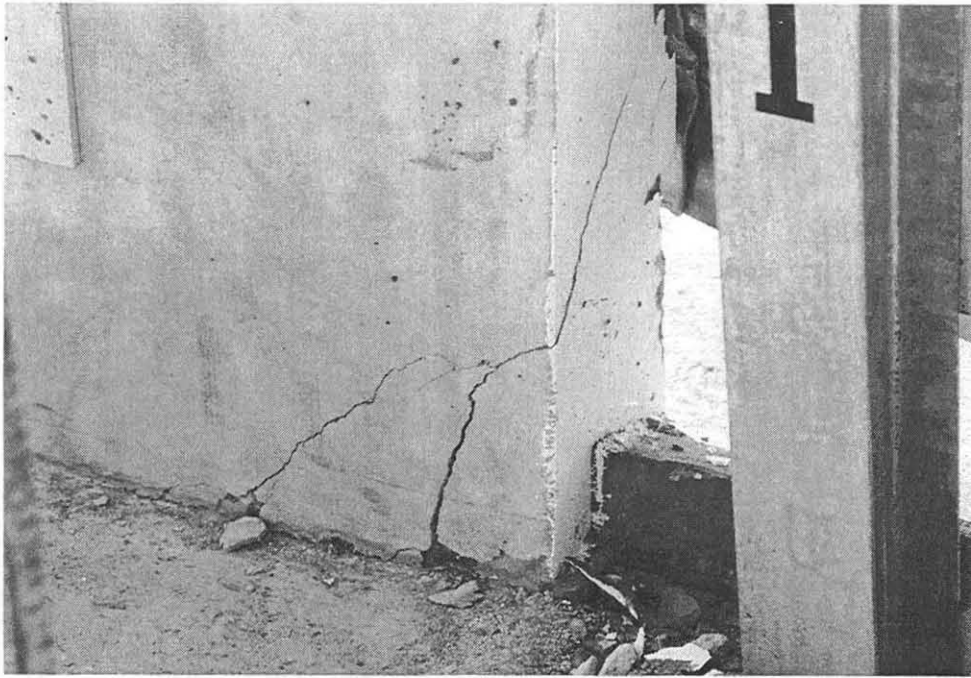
Cracking in Concrete End Section, Test ITNJ-1 (Design No. 1)
